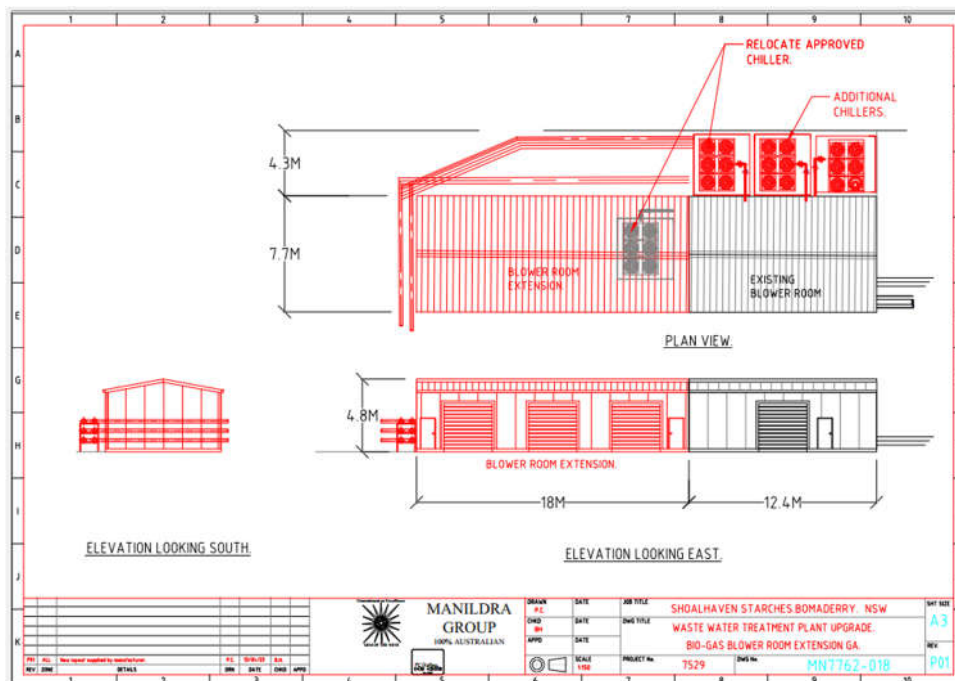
Plan and elevation details proposed Biogas Blower Room Extension
